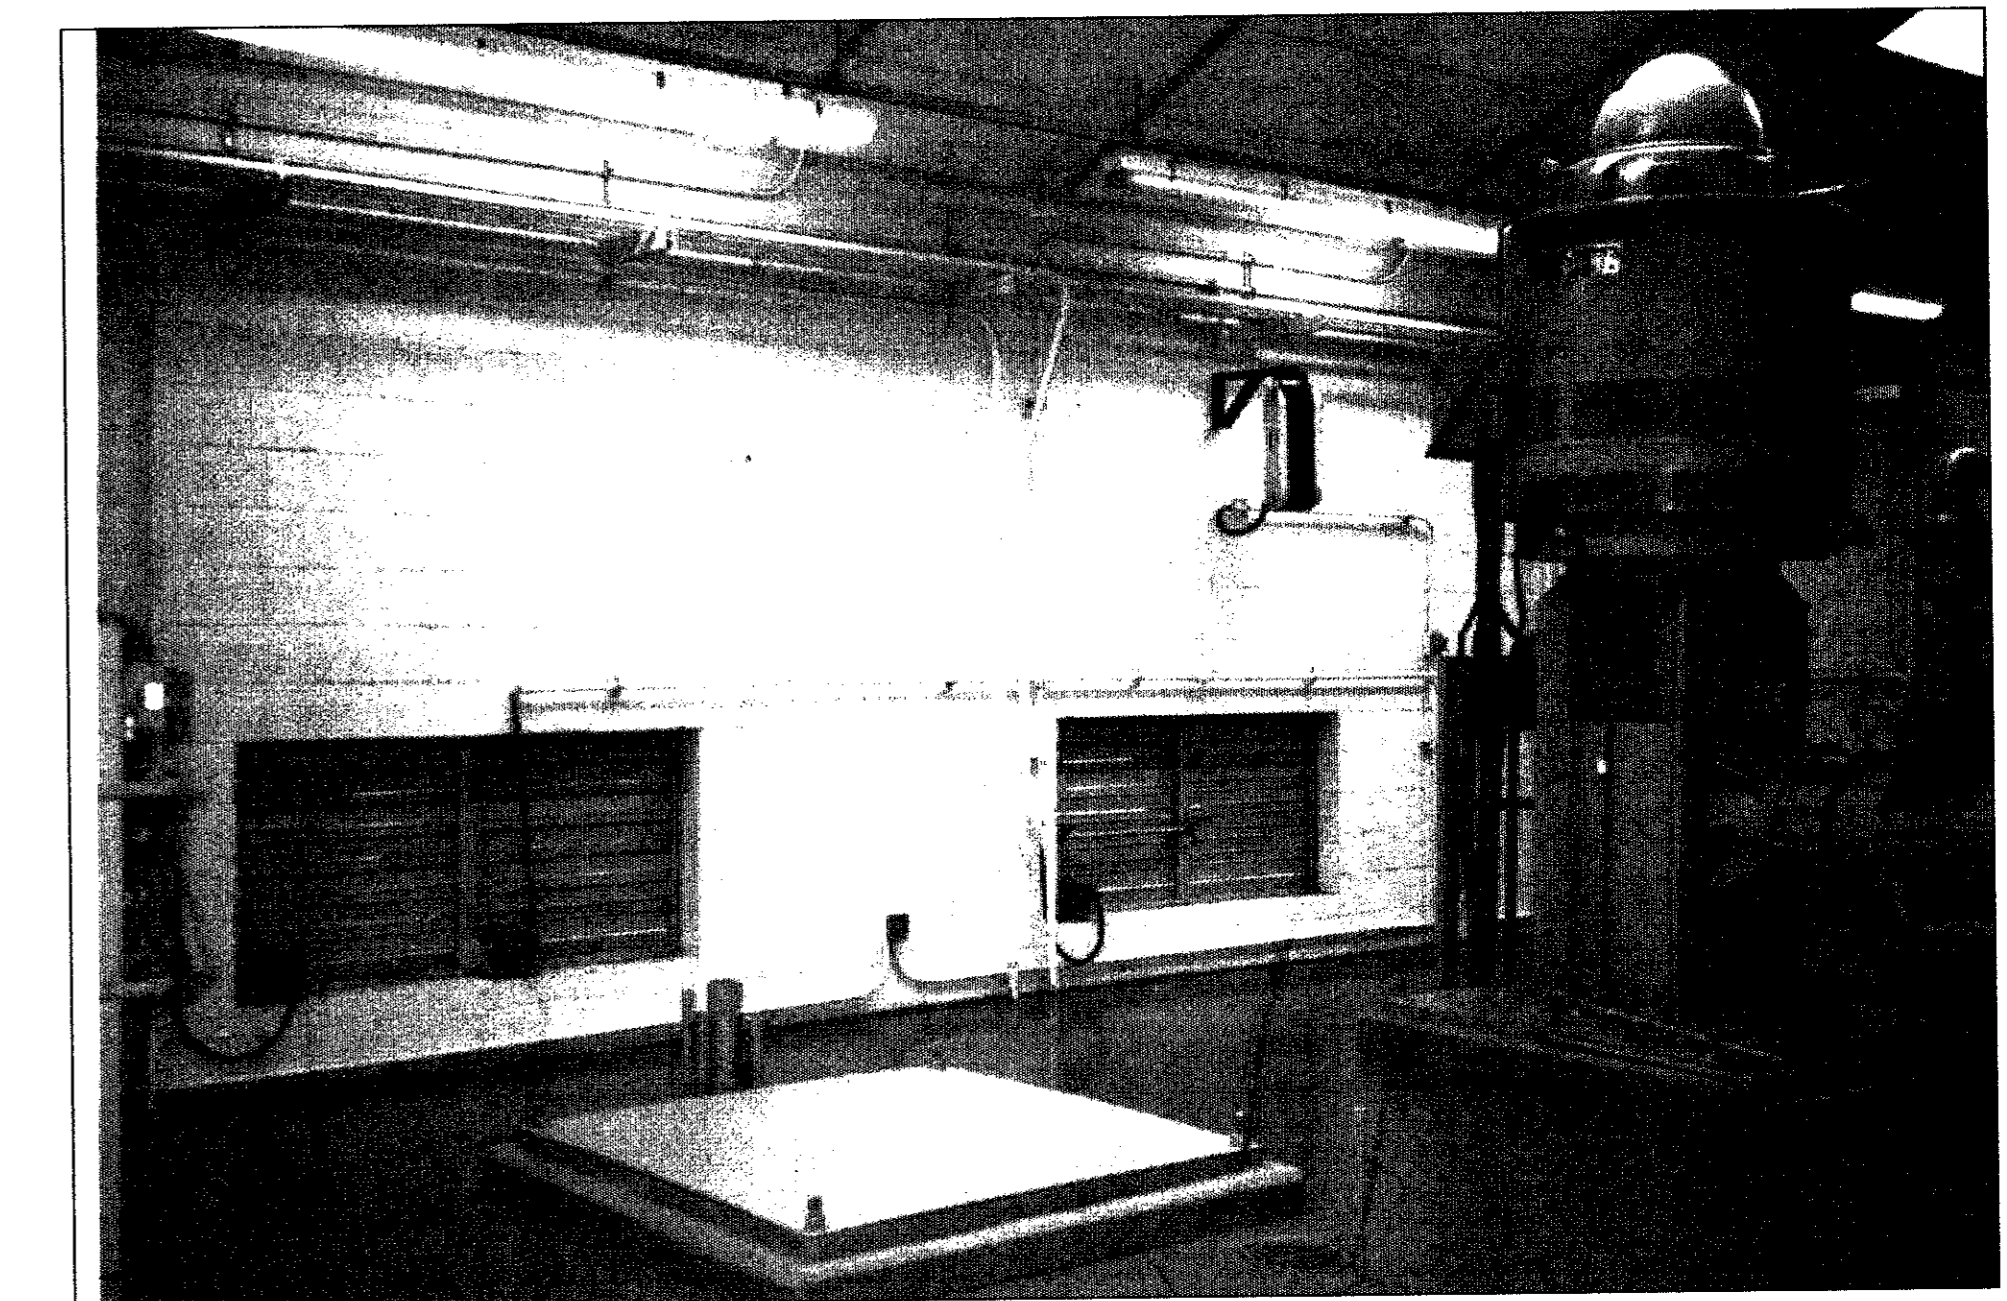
PUMP STATION BUILDING SOUTH WALL
